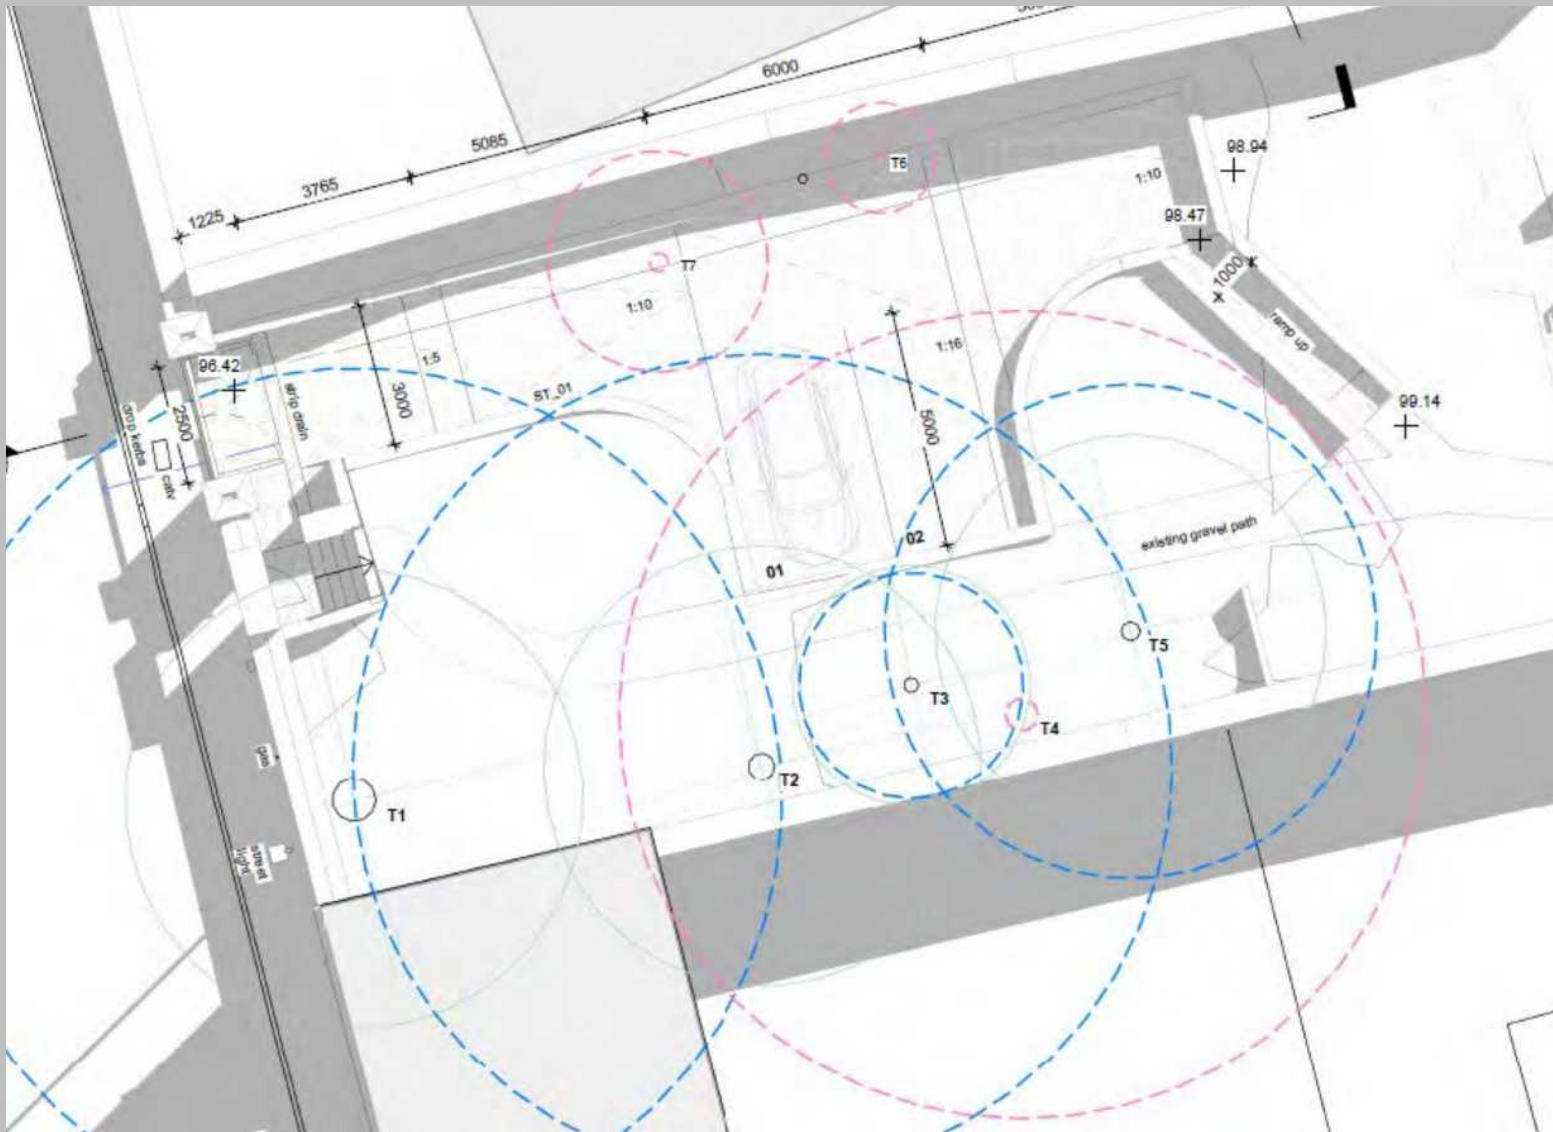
Positioning of car parking to limit impact on Root Protection Areas of retained trees.
